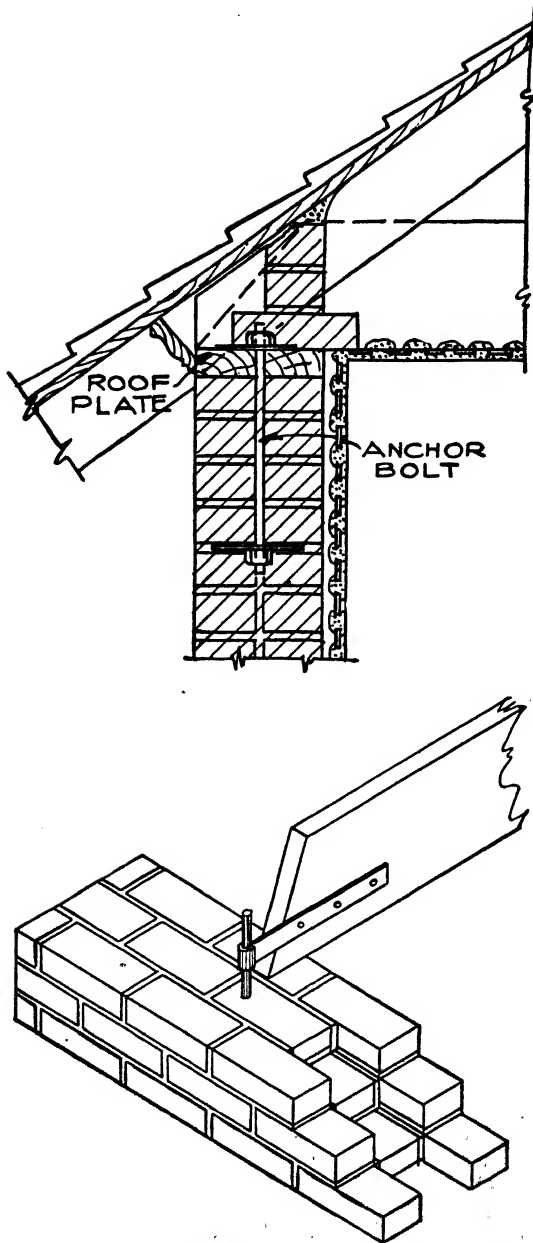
Roof-plate anchor and commonly used type of joist anchor.
